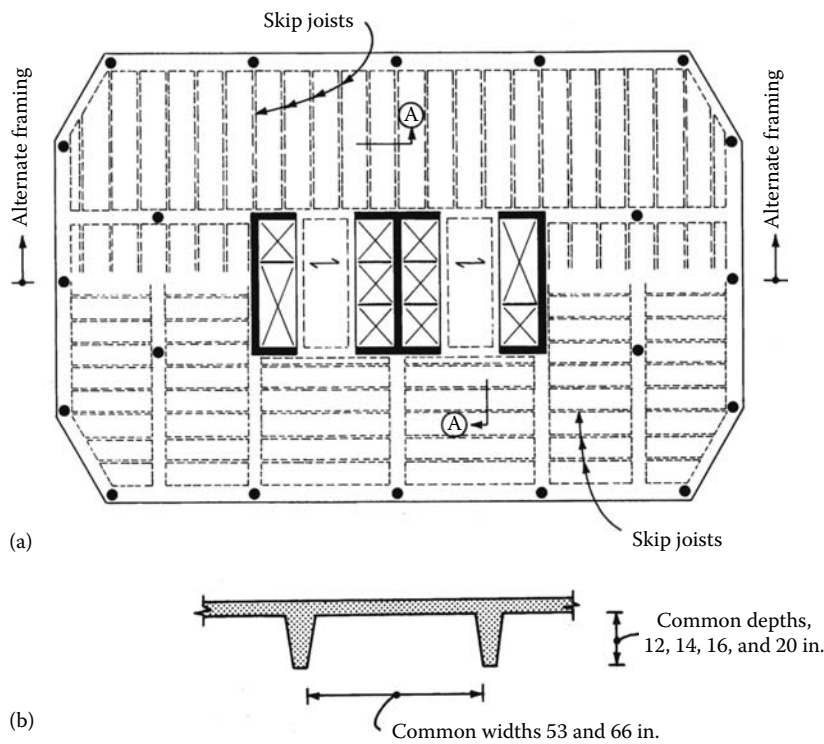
Skip joist system: (a) building plan and (b) Section A.
